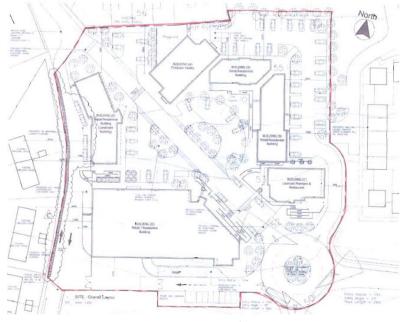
Site Layout Plan WCC Reg. Ref.: 2003/4476
